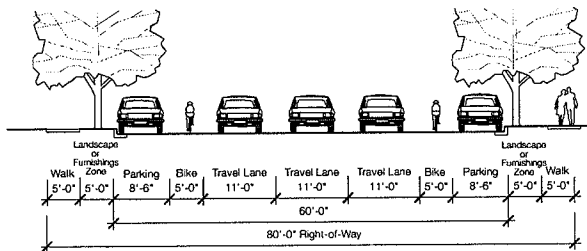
(k)-3: Sample One Way Boulevard - 4th Street
